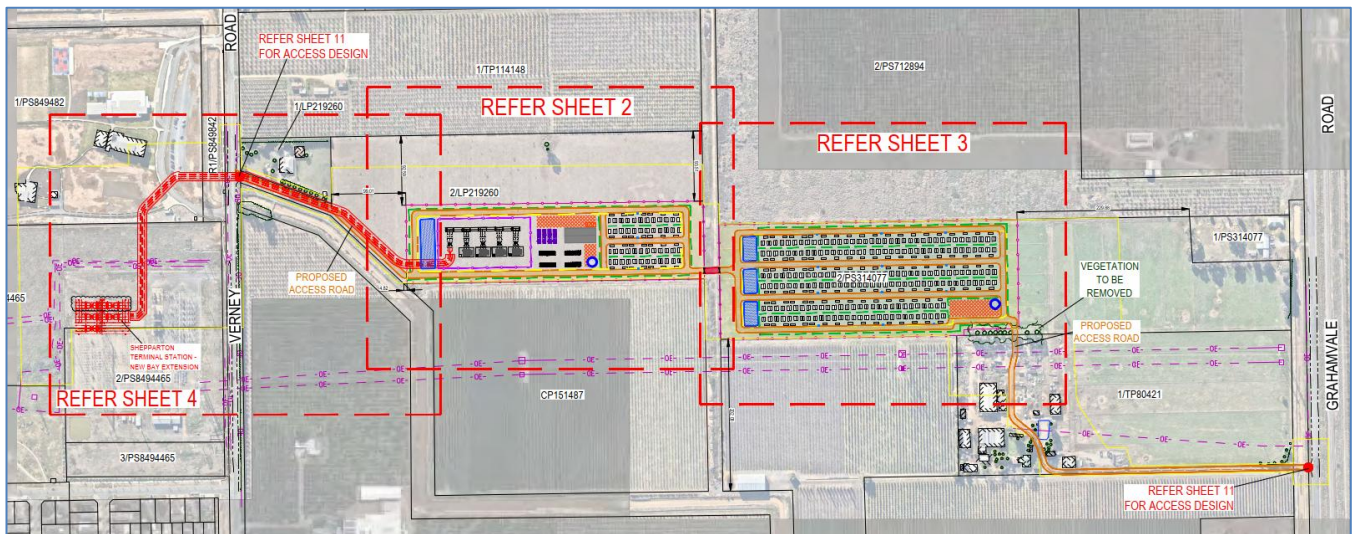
Proposed BESS site, highlighting cable connections and Cable Connection Bay Proposed BESS site and Access Points
